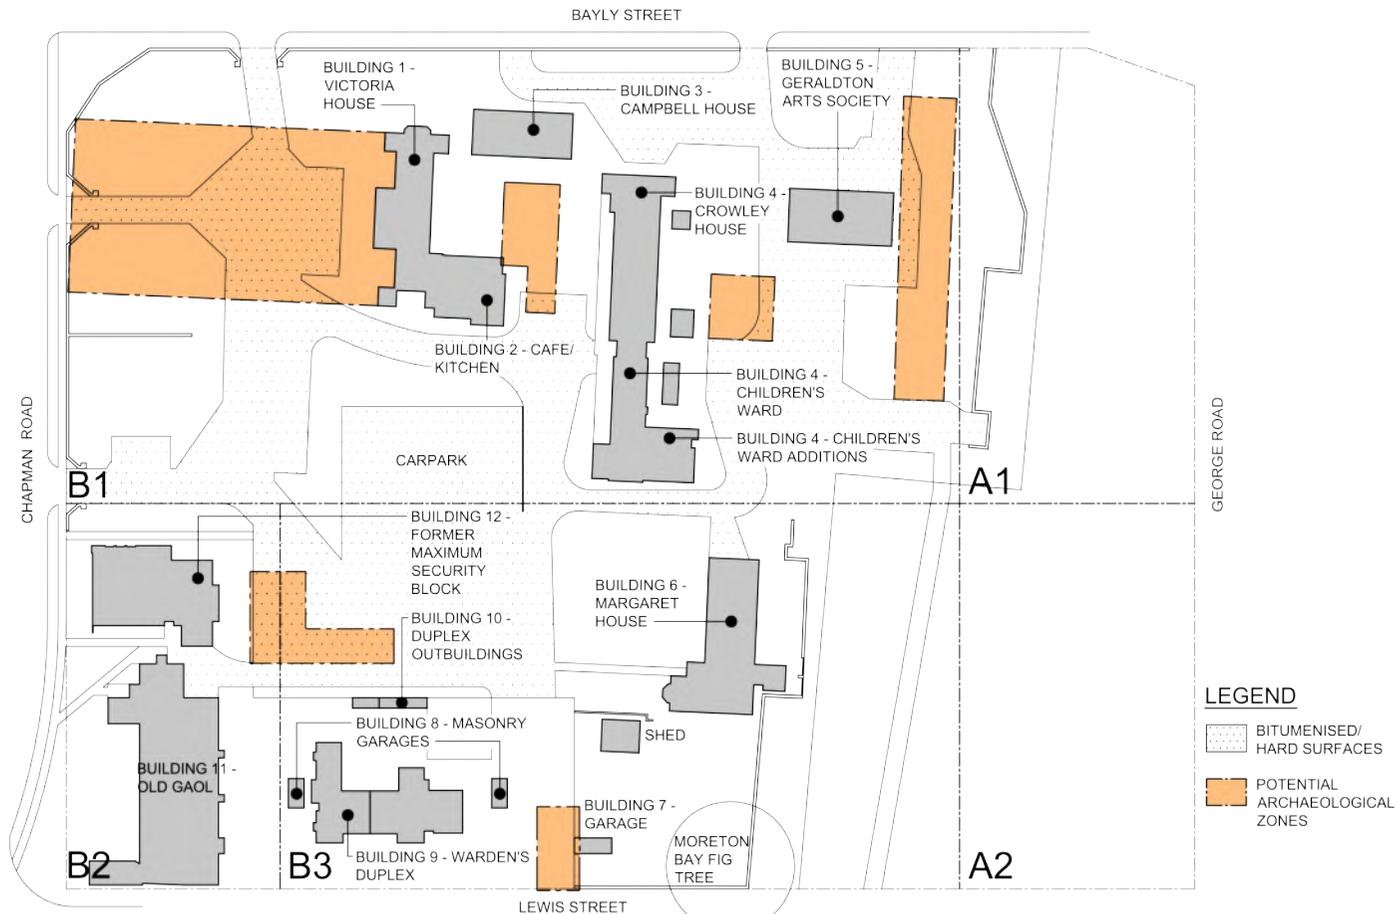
SITE PLAN WITH EXISTING BUILDINGS AND ARCHAEOLOGICAL SITES
